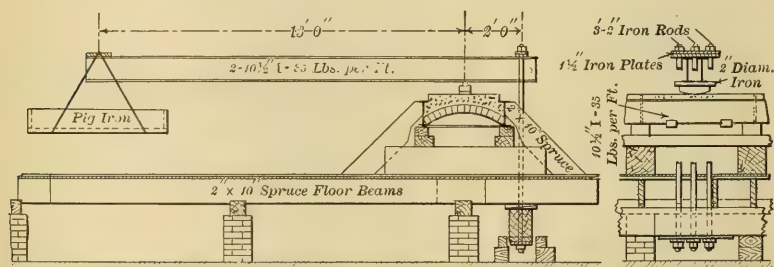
TEST OF ARCHES PROPOSED FOR DRIVEWAY FLOOR OF THE WEYBOSSET BRIDGE.
